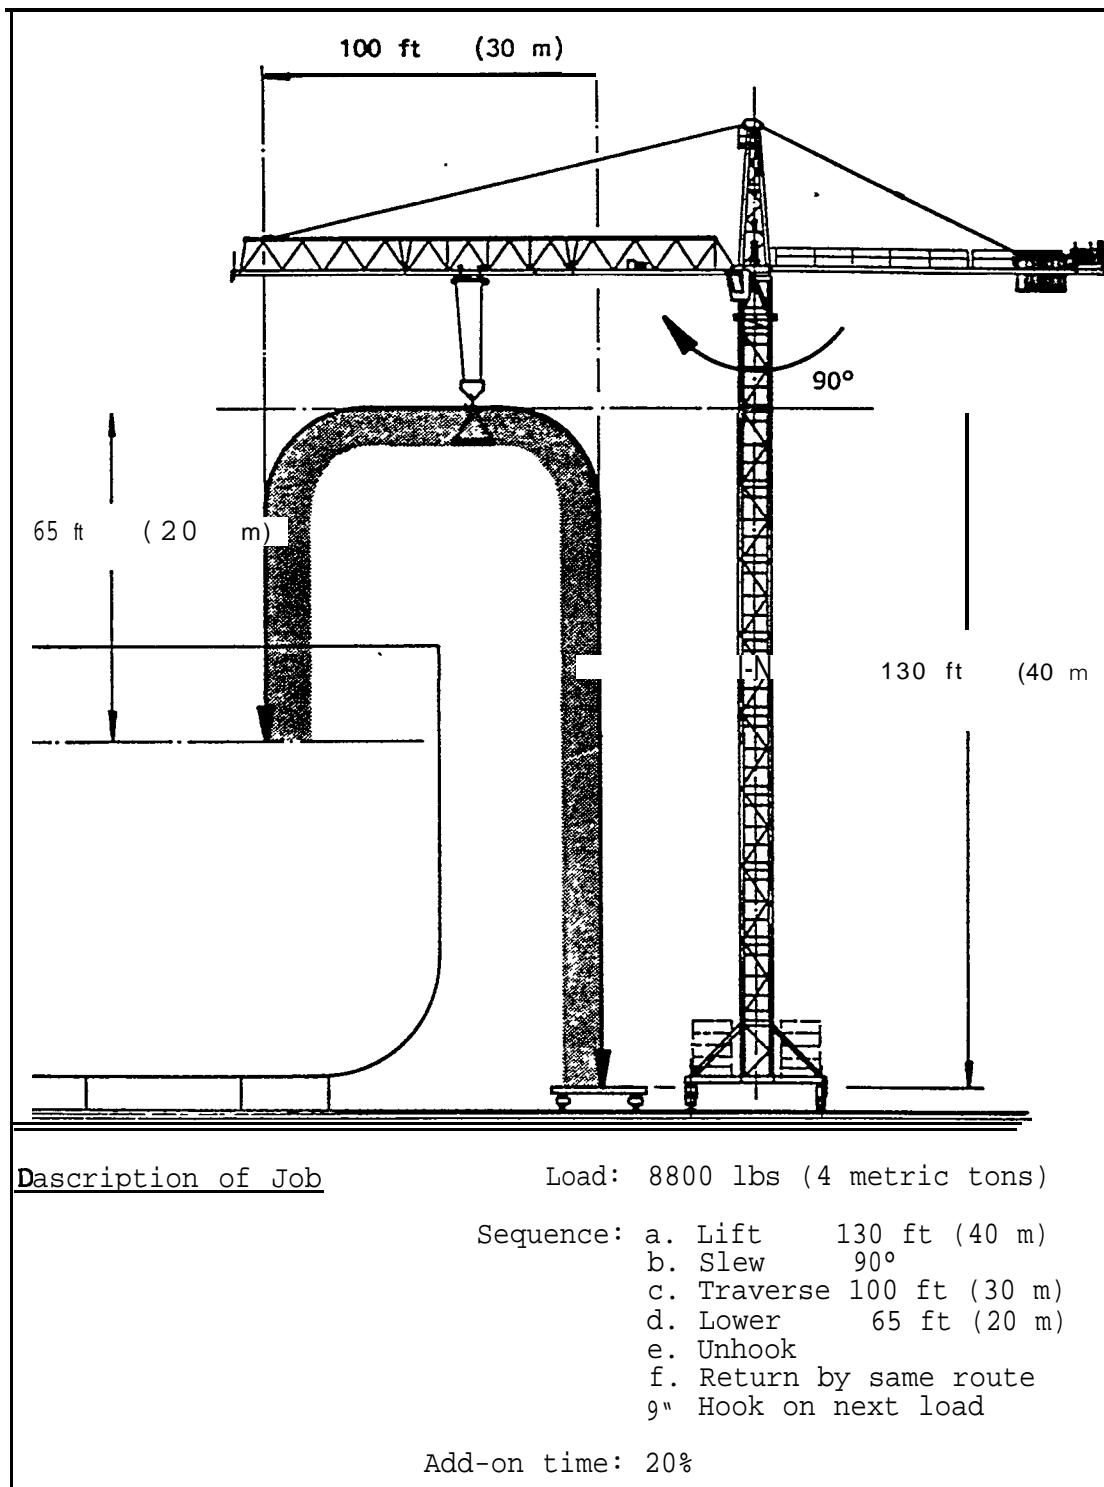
Work cycle analysis for horizontal-jib, top-slewing tower crane
